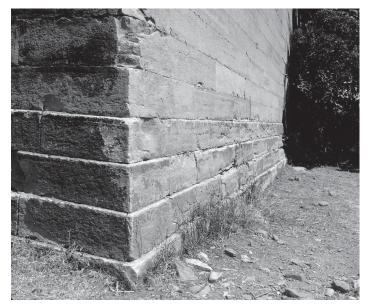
Yəha Temple, Təgray, north façade showing stepped foundation; photo: MG-2006.009:014
